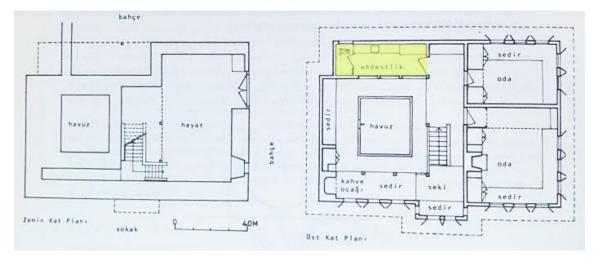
Plan schemes of a Safranbolu house and toilet room on first floor, 1989 (p.22) [14]
